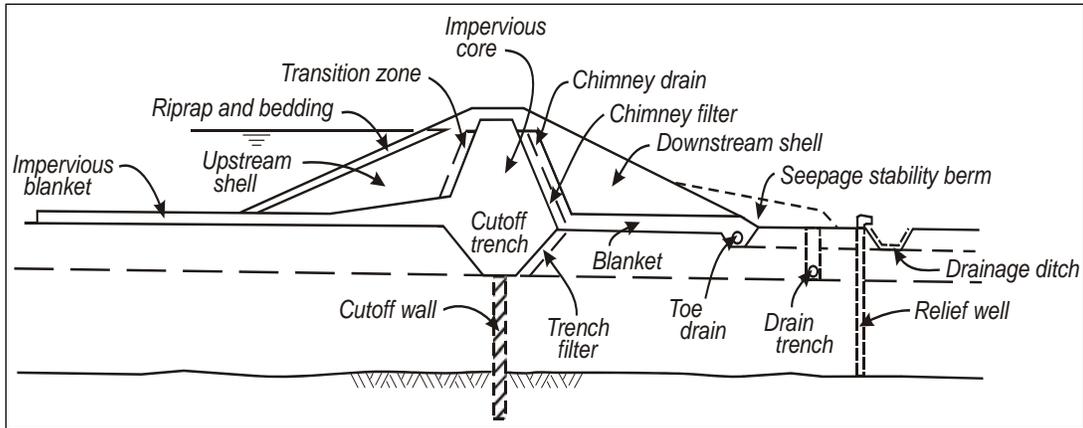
Typical embankment dam design elements found in a central core design.
